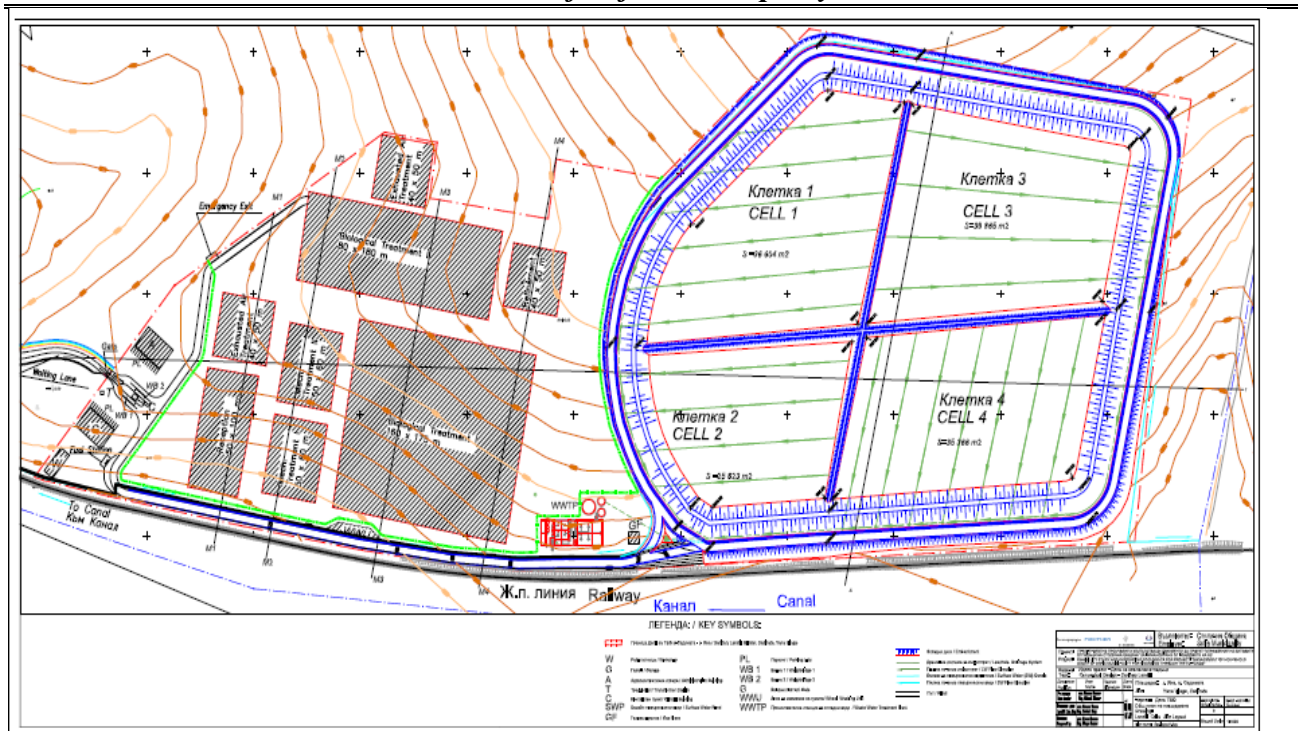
Equipment layout on the Yana-Sadinata site
